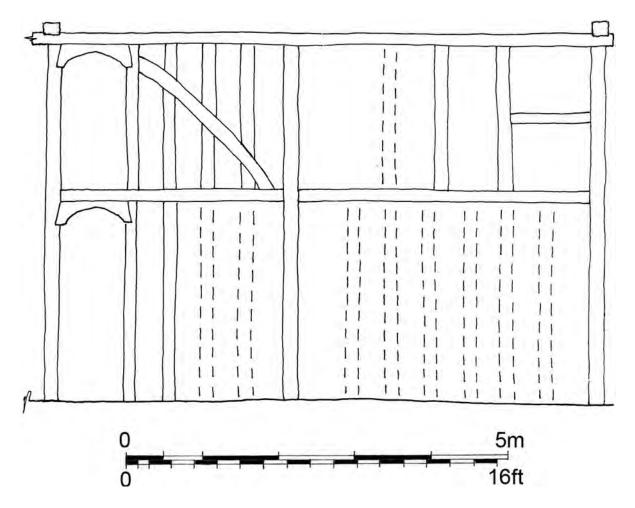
Sketch reconstruction of the exterior of the rear wall of the Sugar Loaves south of the gatehouse, seen from outside
